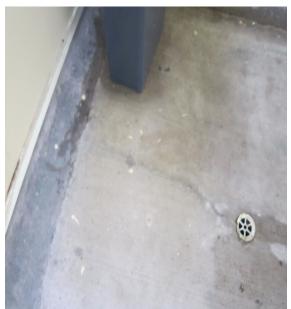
Cracking propagating through floor slab from drainage penetration hairline ~ 0.4mm cracks
